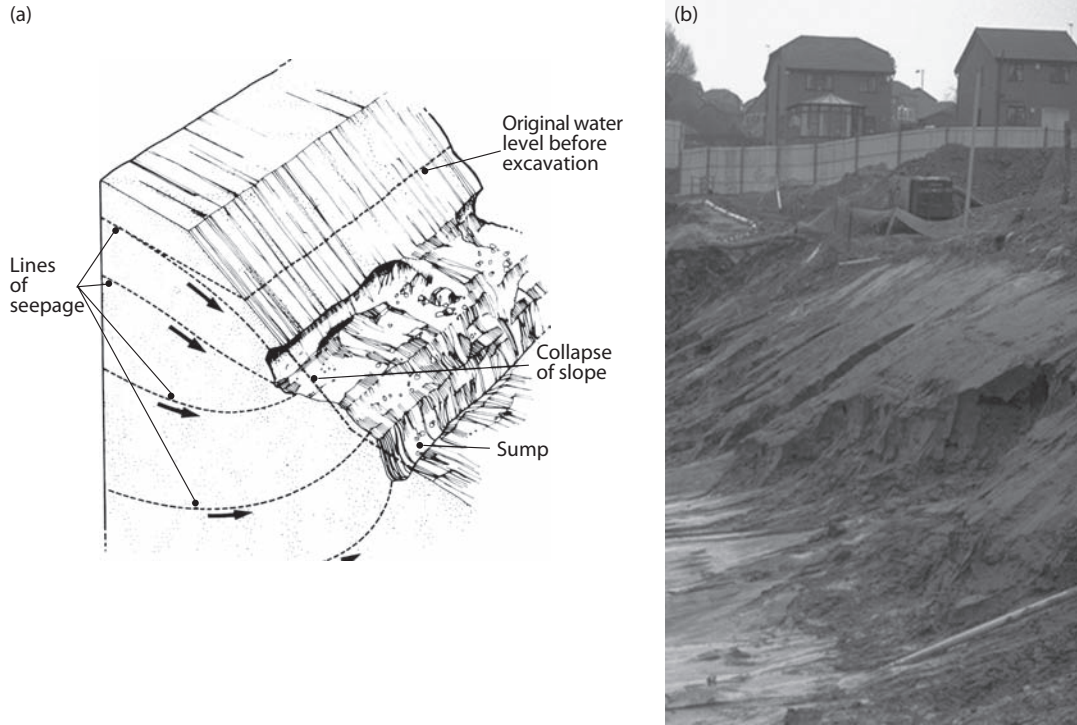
Effect of seepage on excavation. (a) Collapse of excavation caused by seepage from steep slopes. (From Somerville, S.H., Control of groundwater for temporary works. *CIRIA Report 113*, Construction Industry Research and Information Association, London, 1986. Reproduced by kind permission of CIRIA: www.ciria.org.) (b) Unstable excavation slope resulting from seepage. Seepage has eaten back into the slope, and an outwash fan of saturated washed-out material has formed at the base of the slope.
